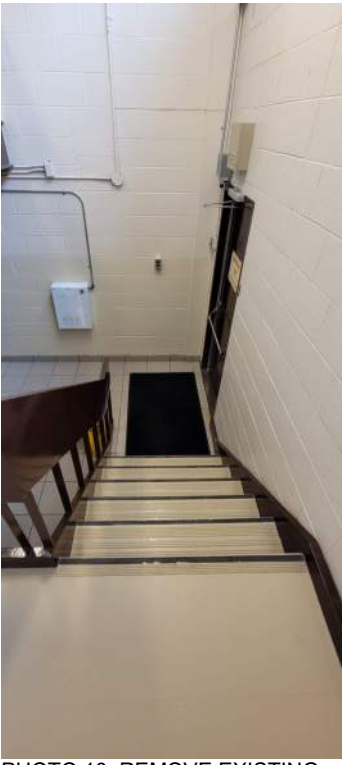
REMOVE EXISTING GUARDRAIL/HANDRAIL AND TEXTURAL WARNING STRIPS (STAIR B)
